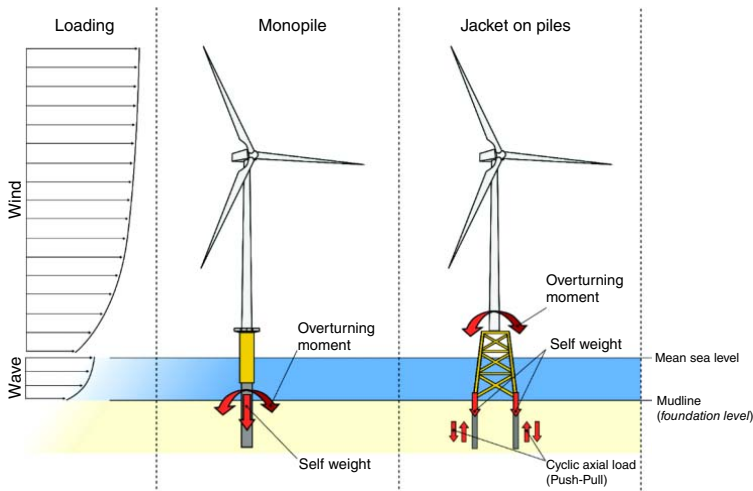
Load transfer for an OWT supported on a monopile and a jacket with multiple pile foundations [153]
